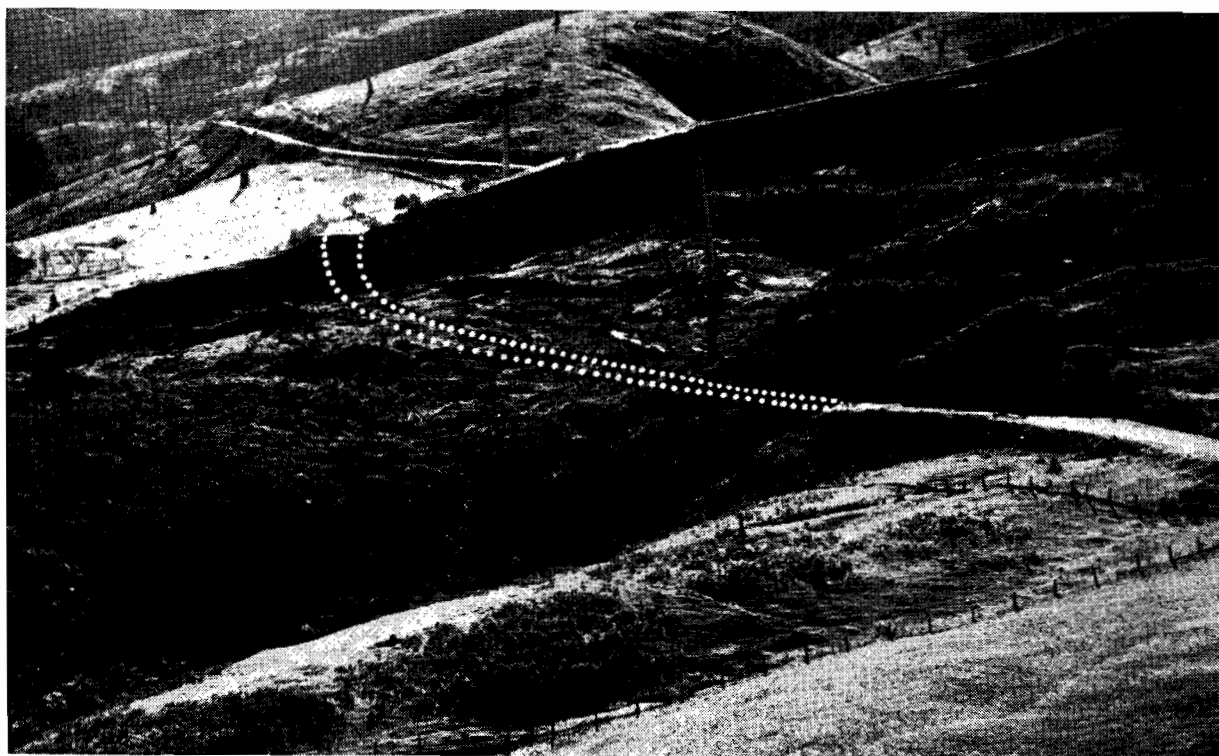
Forrest—Apollo Bay Road. 1,000 feet of road carried down by slip.
